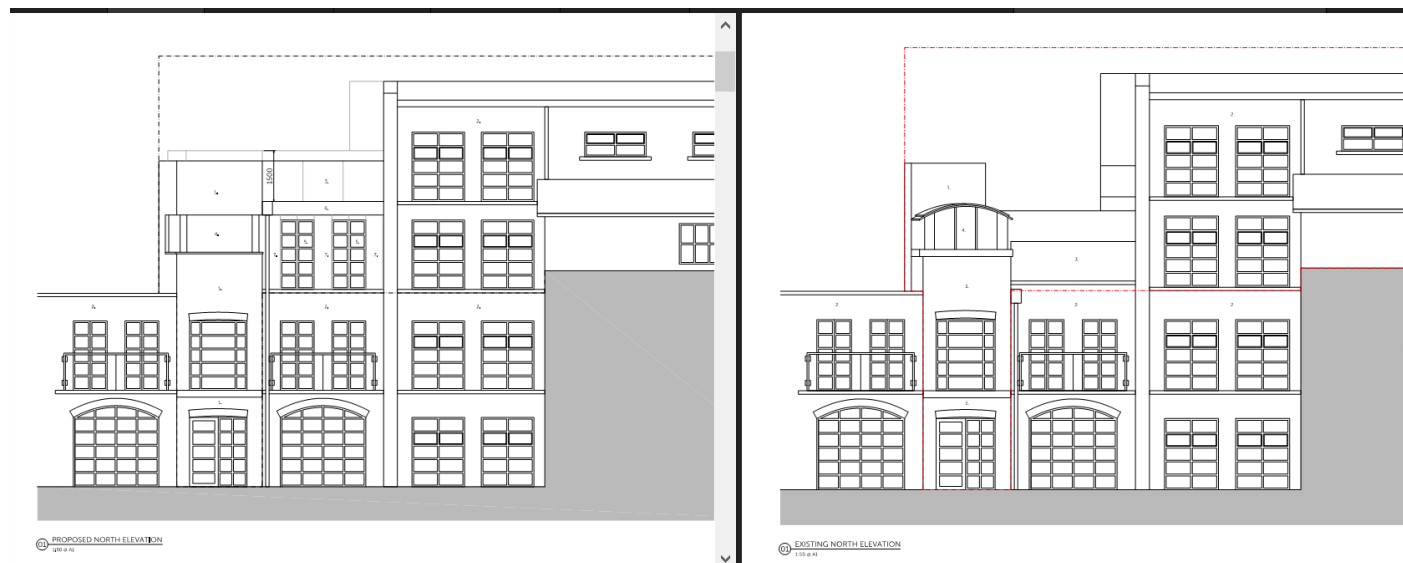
Showing the proposed design on the left with the existing elevation on the right.
